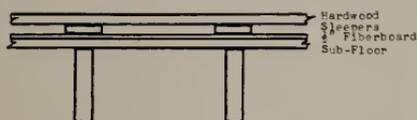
FAIRLY HIGH INSULATIVE FLOOR FOR HOUSE OF WOOD-FRAME CONSTRUCTION
